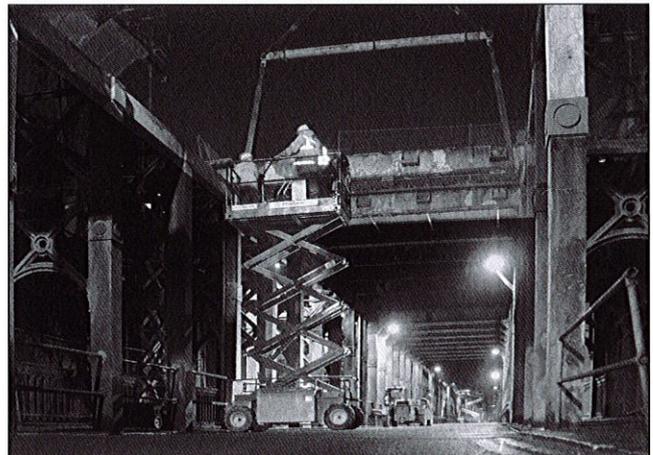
Three 12 m long cast iron rail deck cross-girders were removed from an un-trafficked area
